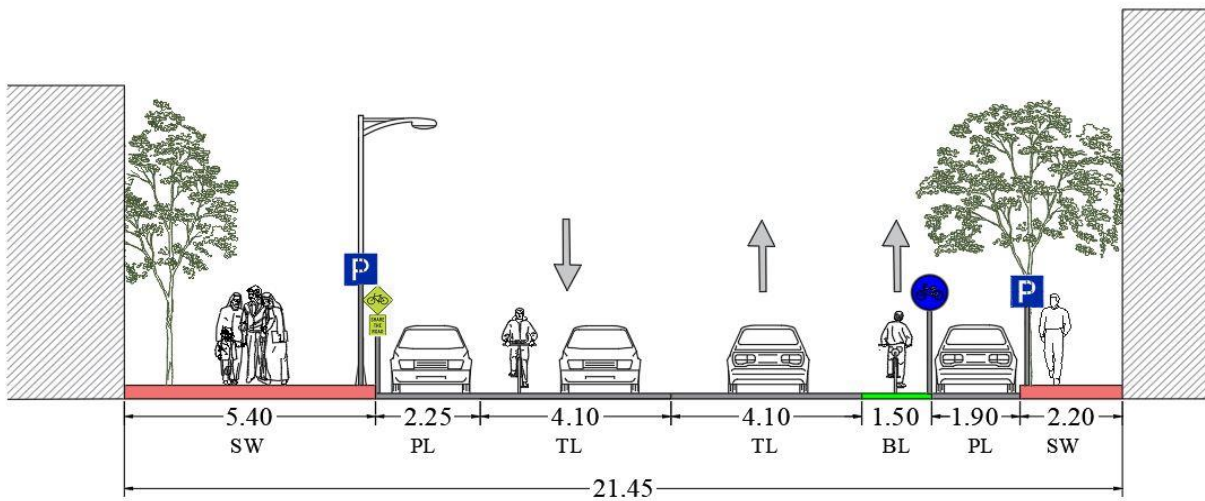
11: Typical Cross Section C-C, Rafidia Street
